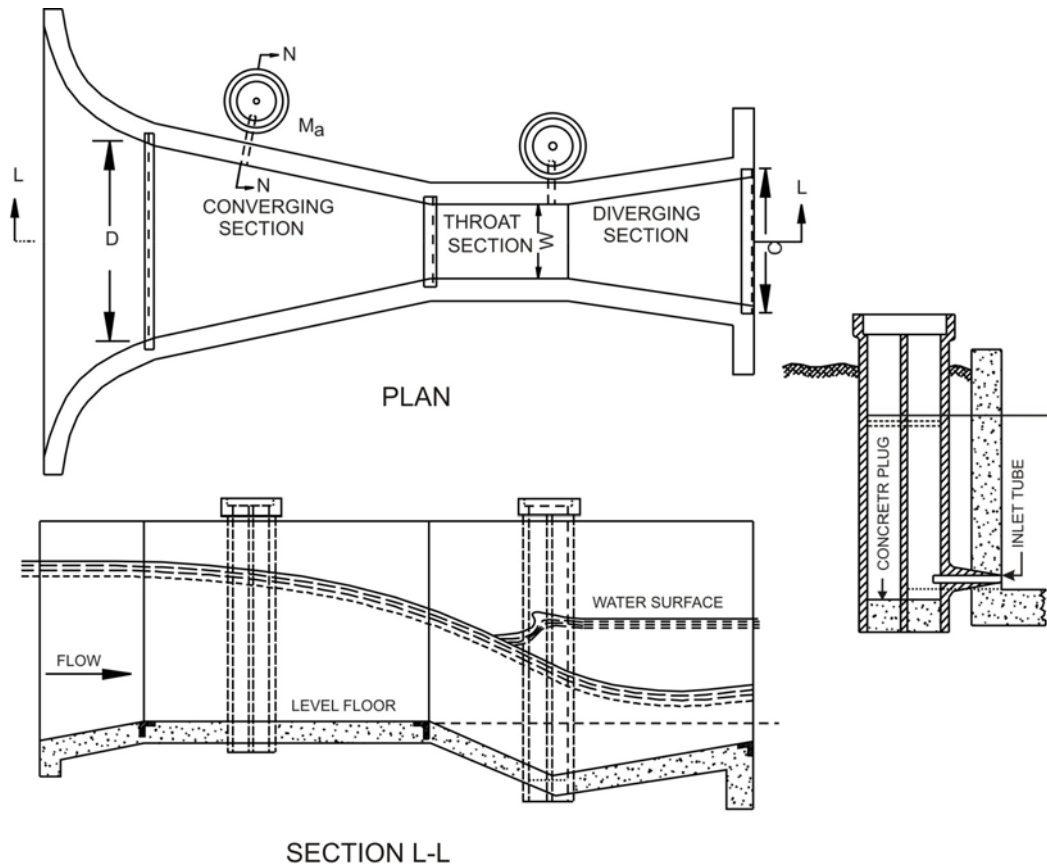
PLAN AND SECTION OF PARSHALL MEASURING FLUME
